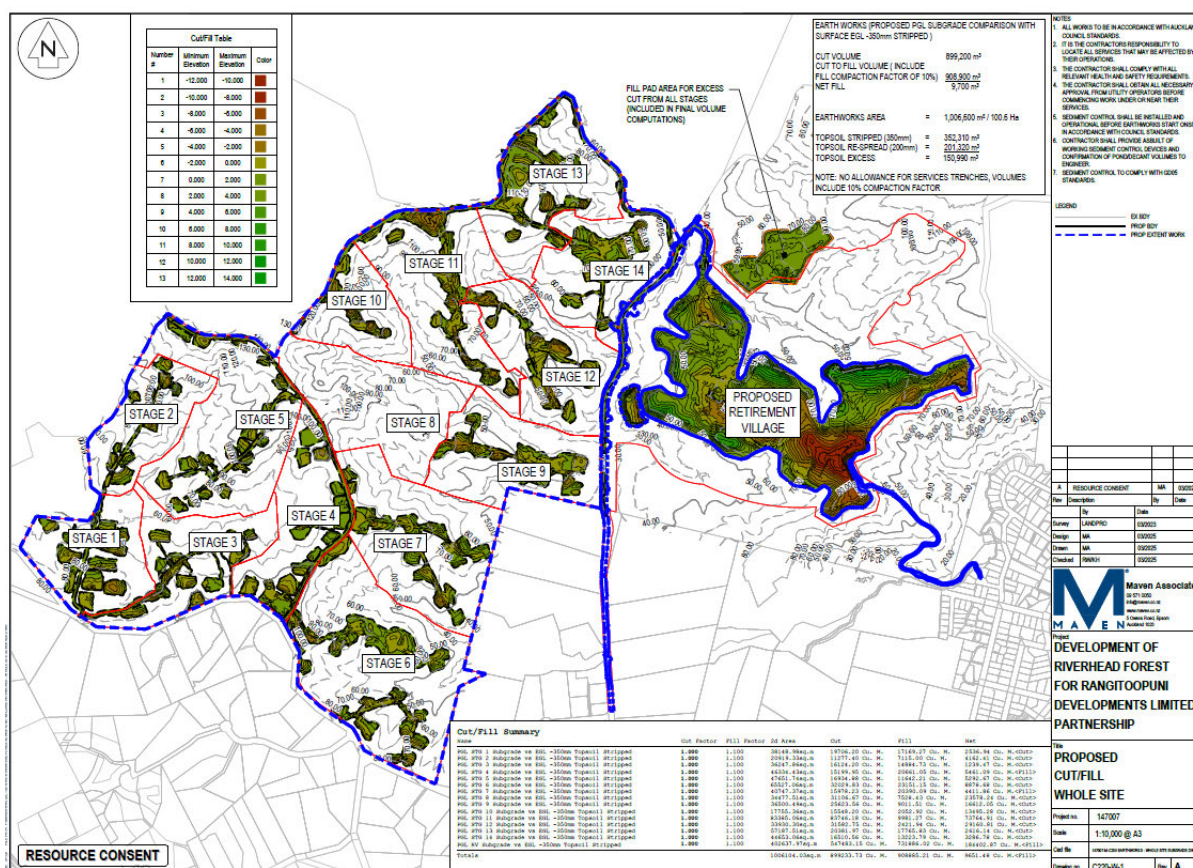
OVERALL SITE CUT/FILL PLAN
